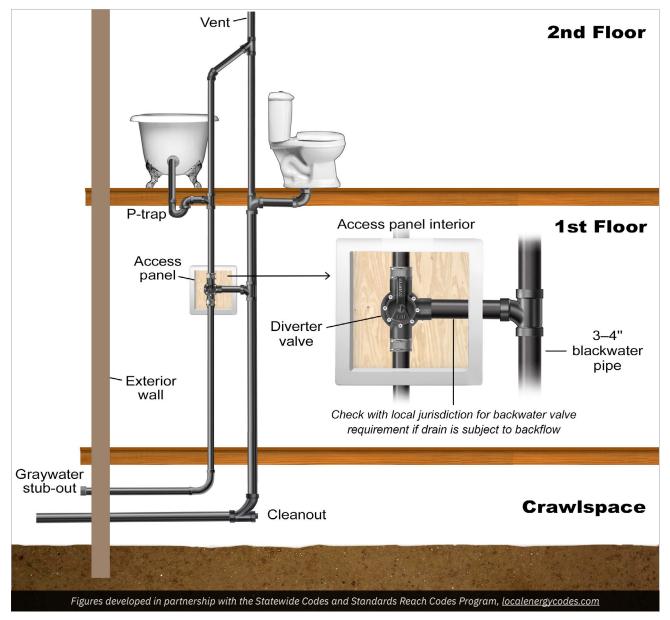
Dual Drainage Plumbing: Single fixture on second floor with stub-out above grade, from crawl space under the first floor
